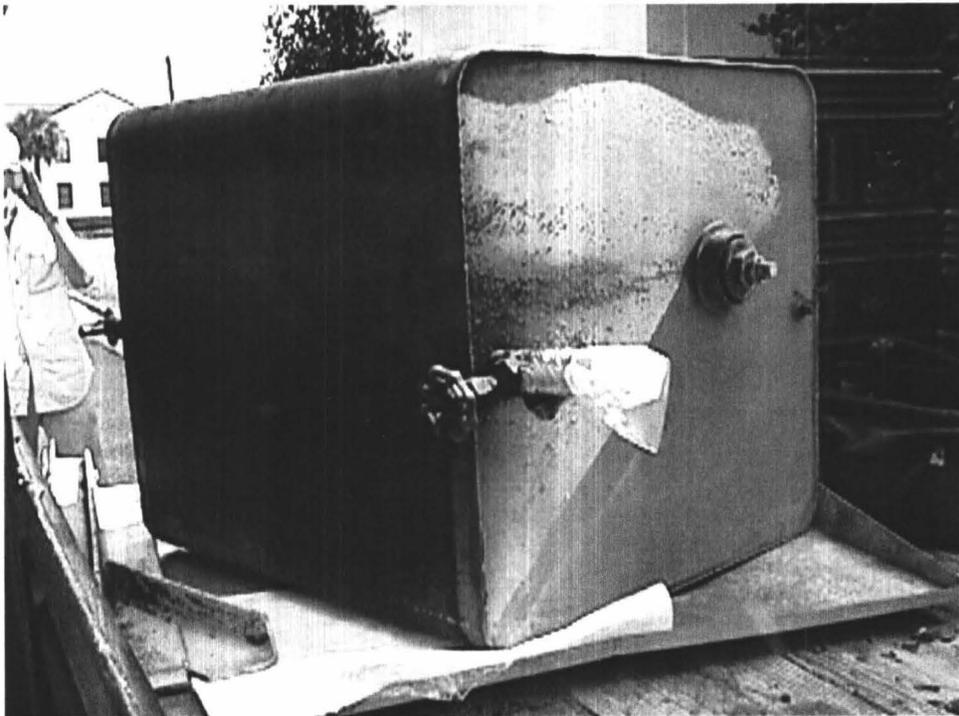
Generator tank above day tank at Building 200 (CSC-2).
